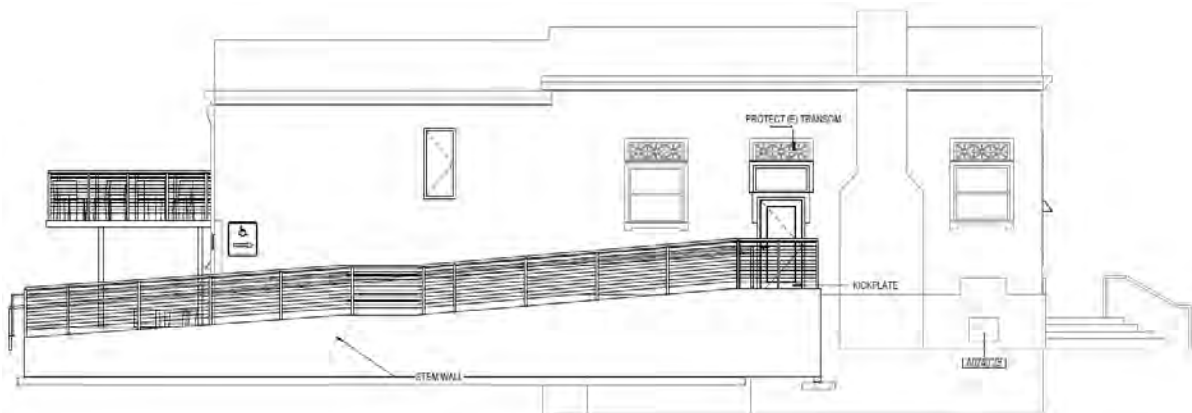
West (side) elevation. Plans courtesy of ORW Architecture. November 2022.
